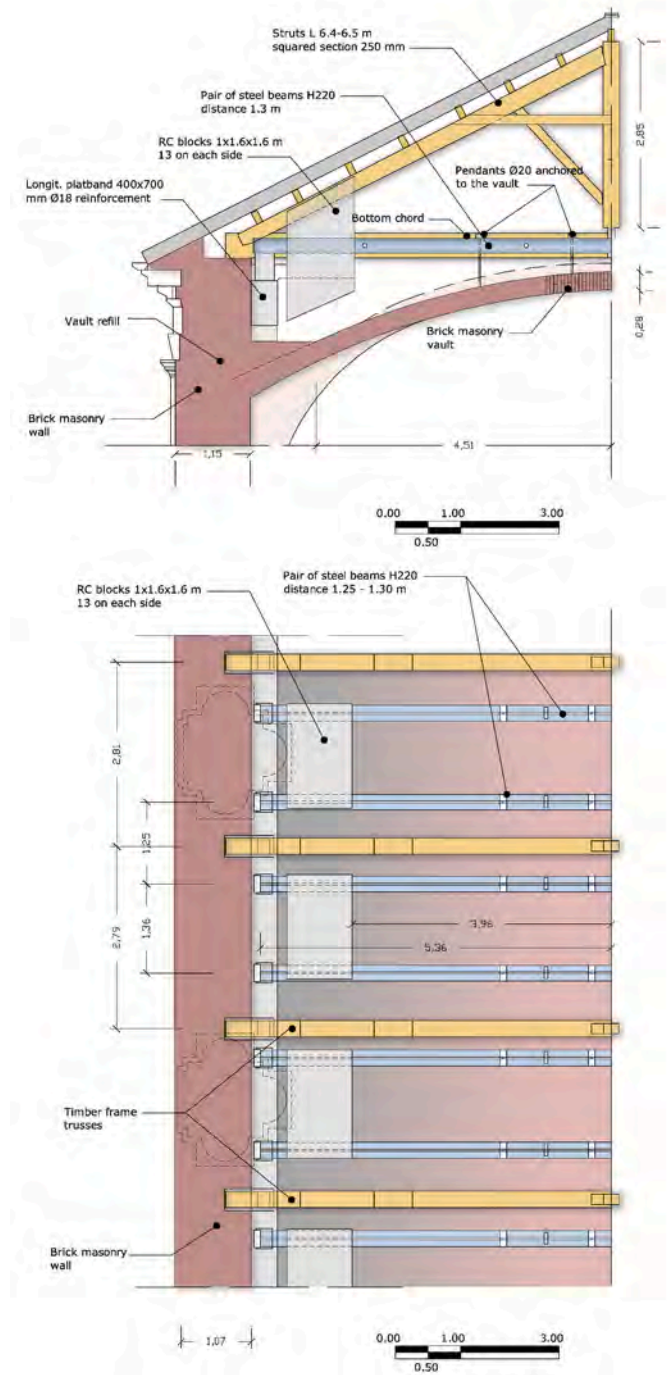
Positioning of the original timber trusses and of the reinforcing paired steel beams posed in 1926–28. The works involved the removal of chains inside the church the placement of pendants and blocks.
